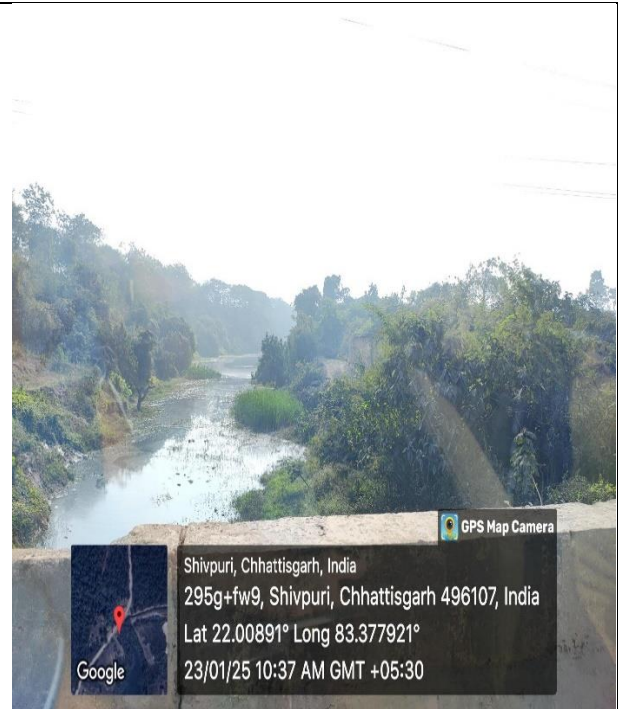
Canal Crossing the Proposed Pipeline Route in near Raigarh Town
